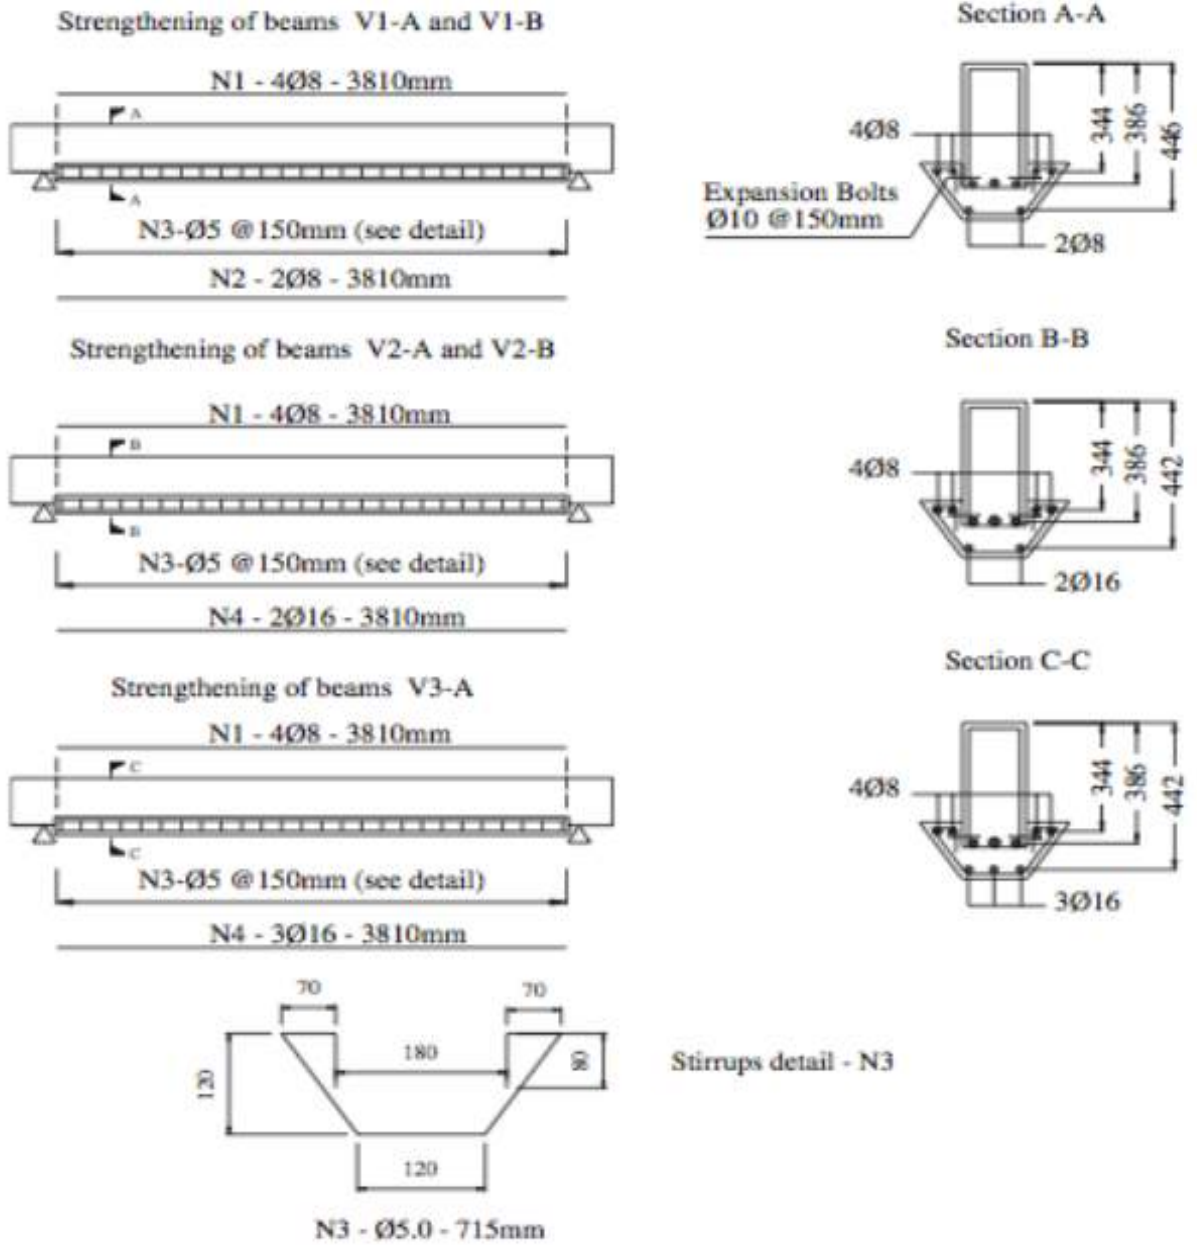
Details of reinforcement in the jackets (Source: Shehata and Shehata, 2008).
